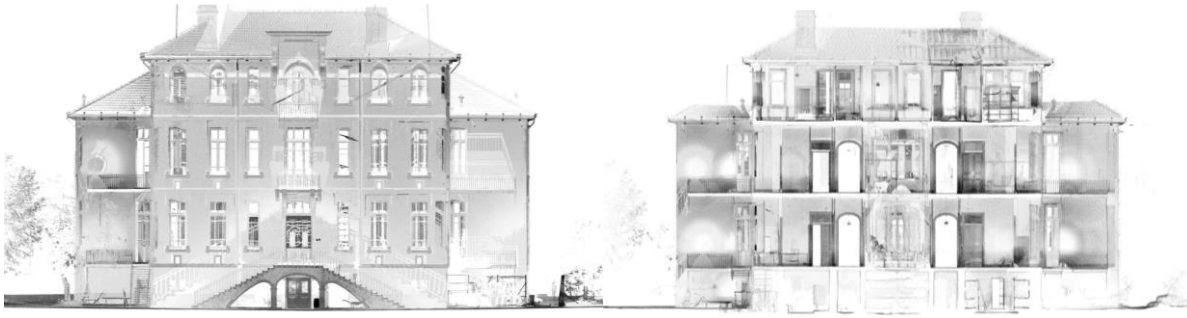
Orthoimages - elevation on the left and section on the right
